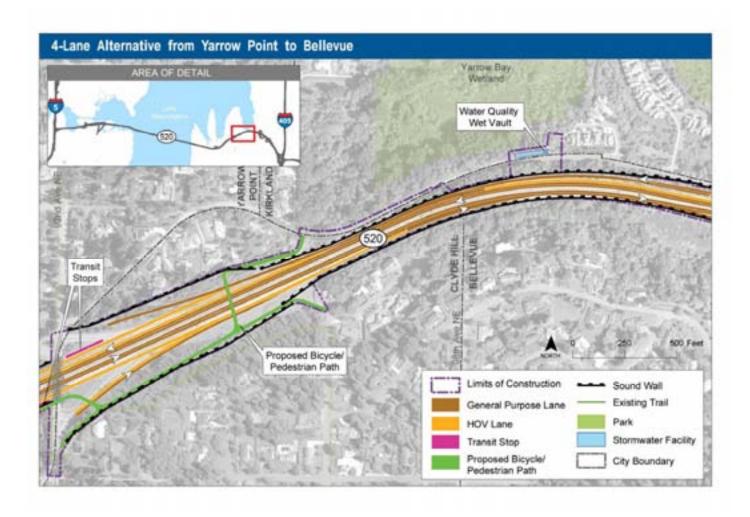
4-Lane Alternative from Yarrow Point to Bellevue
